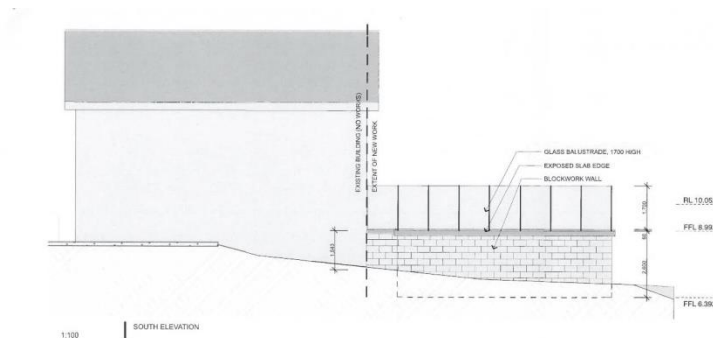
Southern elevation of proposal at 137 Risdon Road, Lutana.
